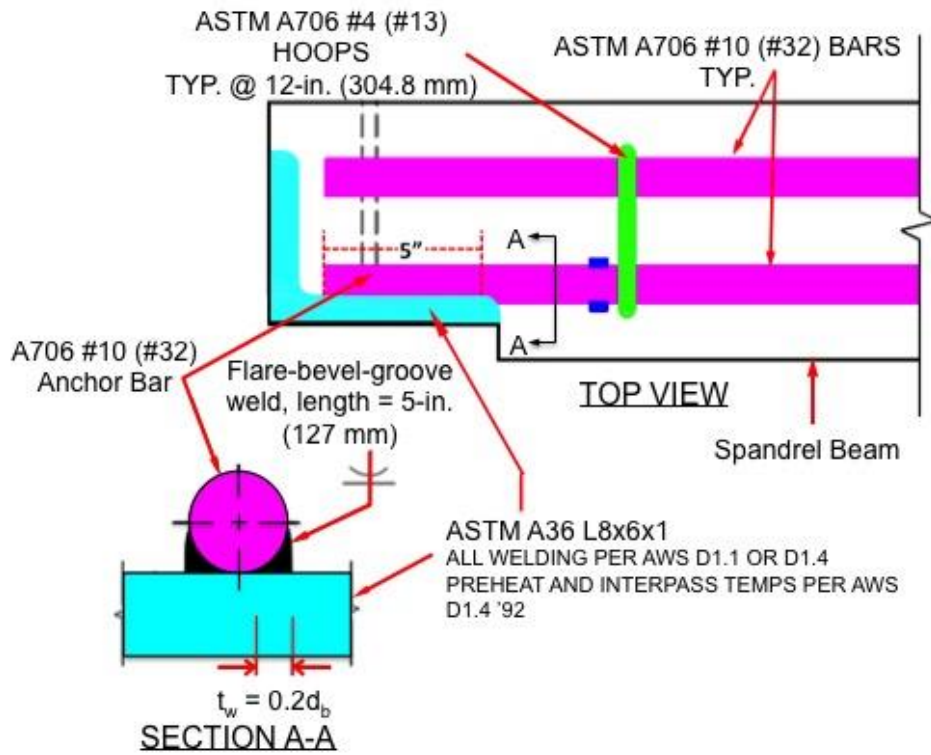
Welding details on M6 and M7 beam embedded angles
